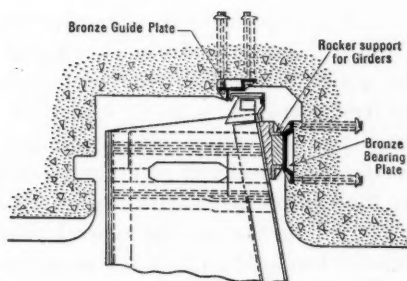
SECTION THROUGH SLOT IN WALL, SHOWING BEARING AND GUIDE-PLATES.
